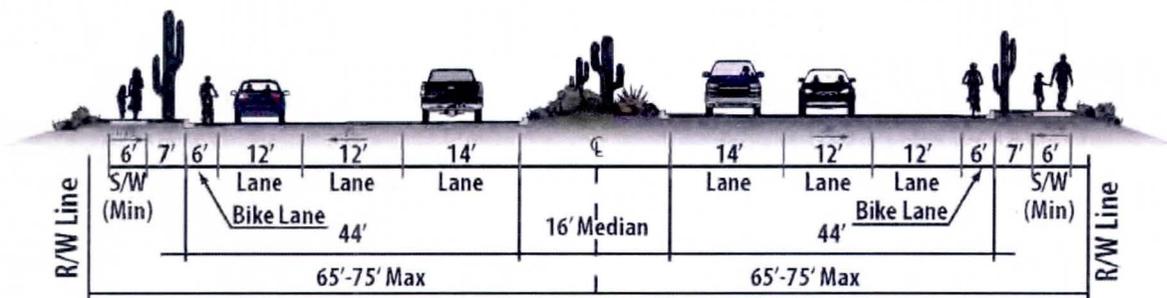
Ultimate Roadway Cross Section – Southern Avenue to Germann Road
